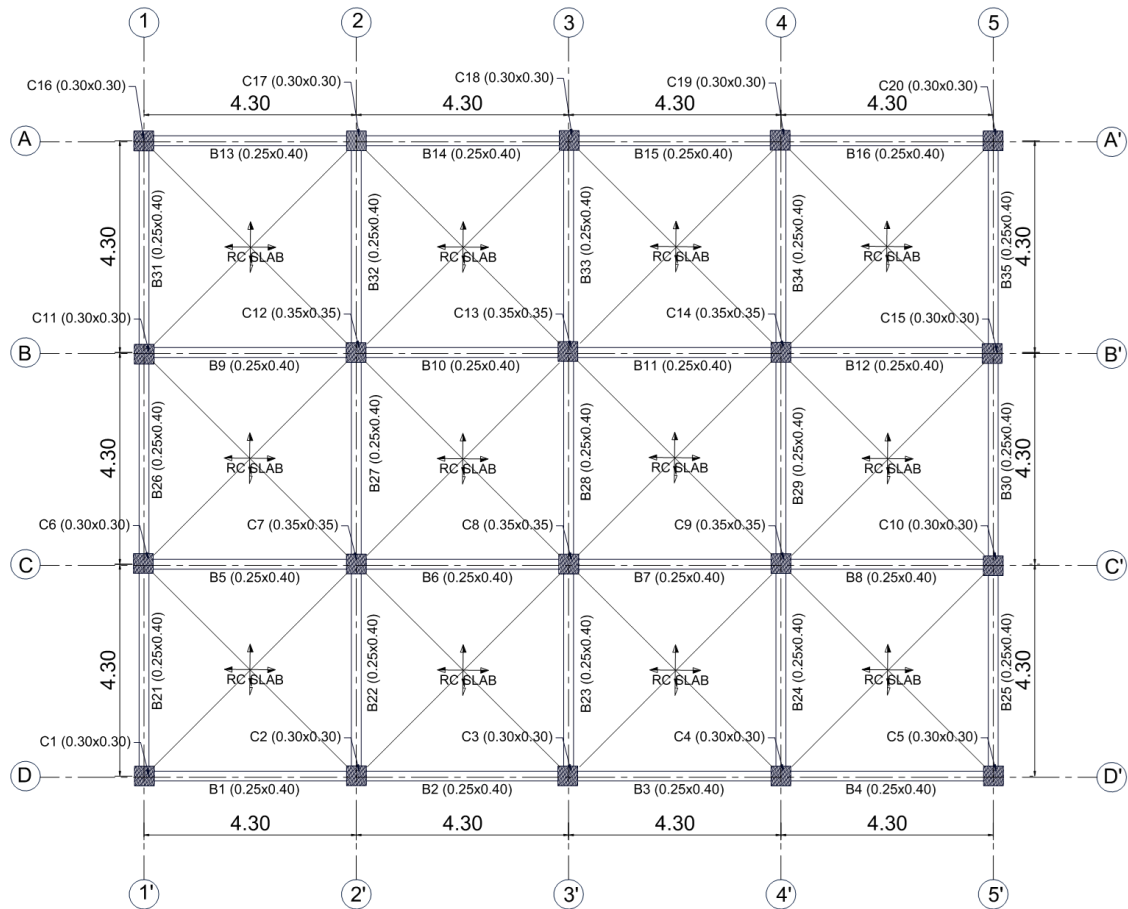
Layout of the structural system considered in the example application involving 20 columns and 31 beams and that represent one storey of a residential building.
